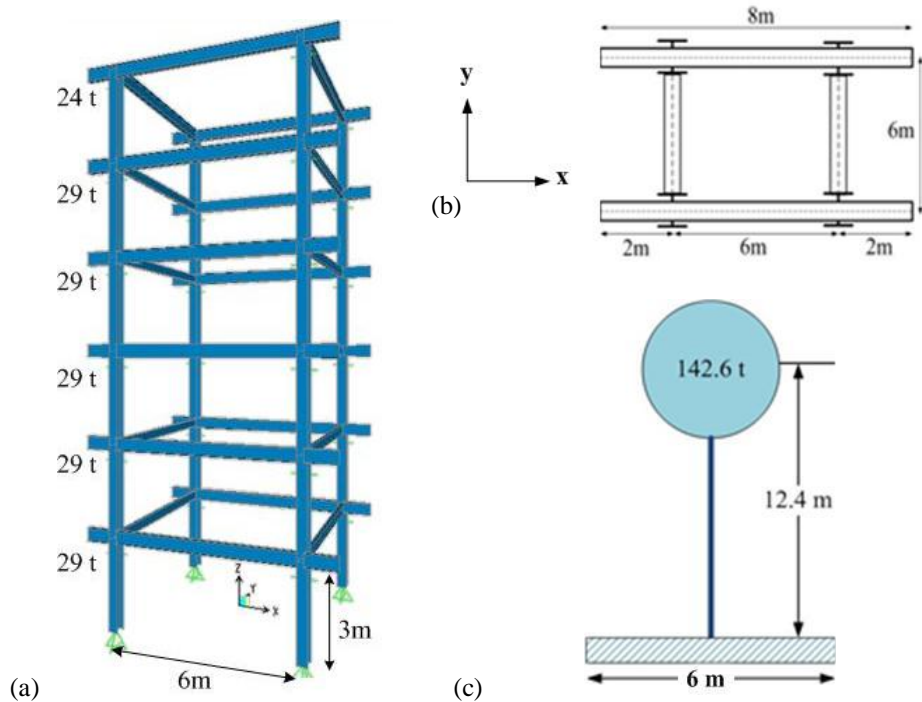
Prototype: (a) 3-D view, (b) the beam and column arrangement and (c) the SDOF system
